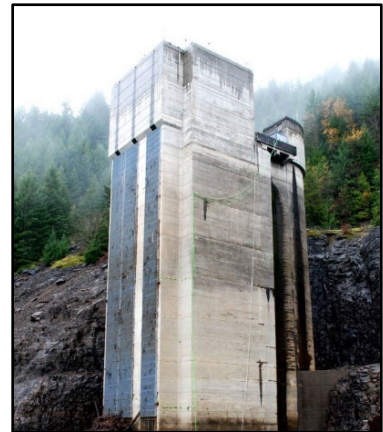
Water Control Tower at Cougar Dam (a selective withdrawal structure).
